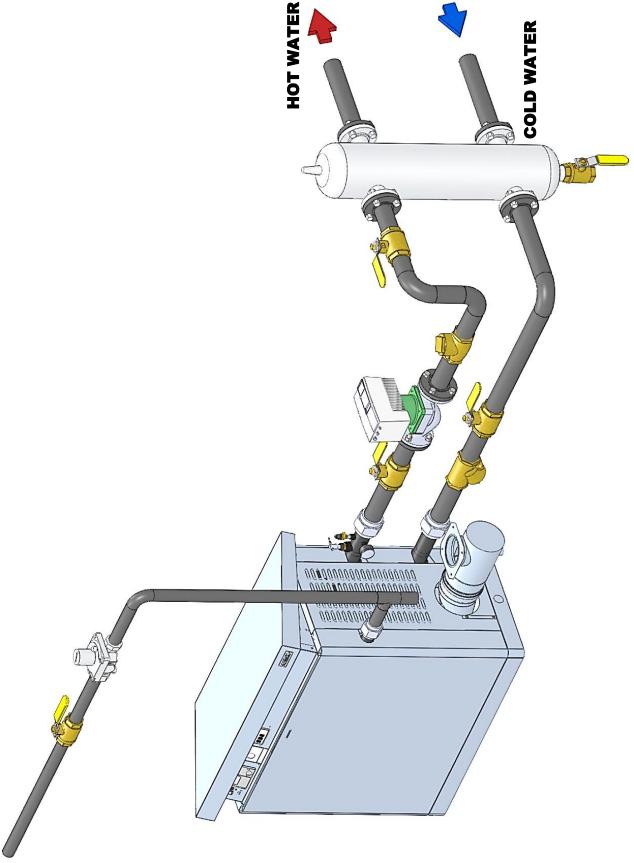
Modulex EXT Single Boiler Installation with Hydraulic Separator Installed
